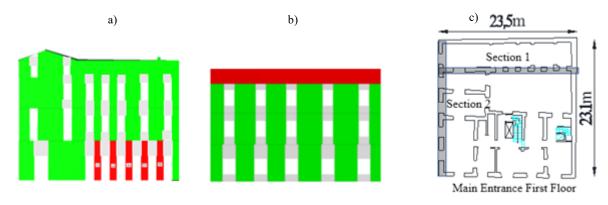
Results of the review of the most critical sections: a) Section 1; b) Section 2; c) First floor.
